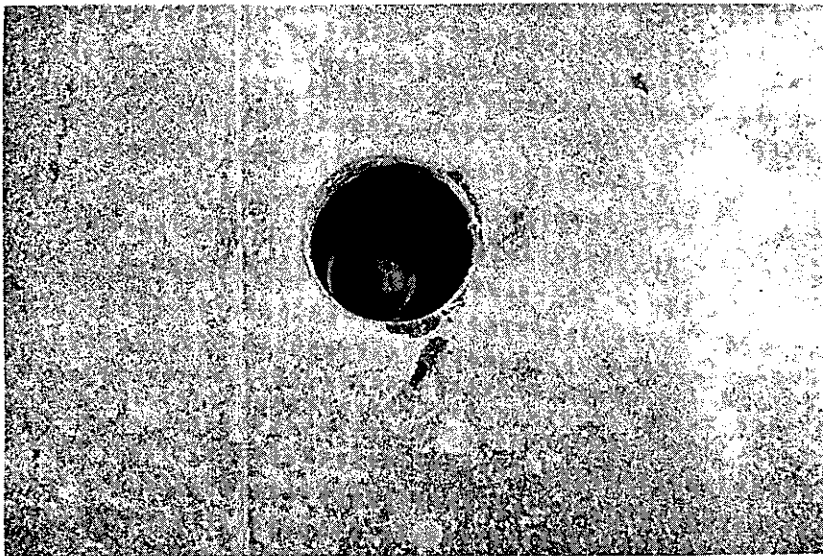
Looking down into hole 2 after drilling to 18-in. depth; water stood 12 inches below top of pavement--from water used in drilling hole; light is being reflected off water in hole.
